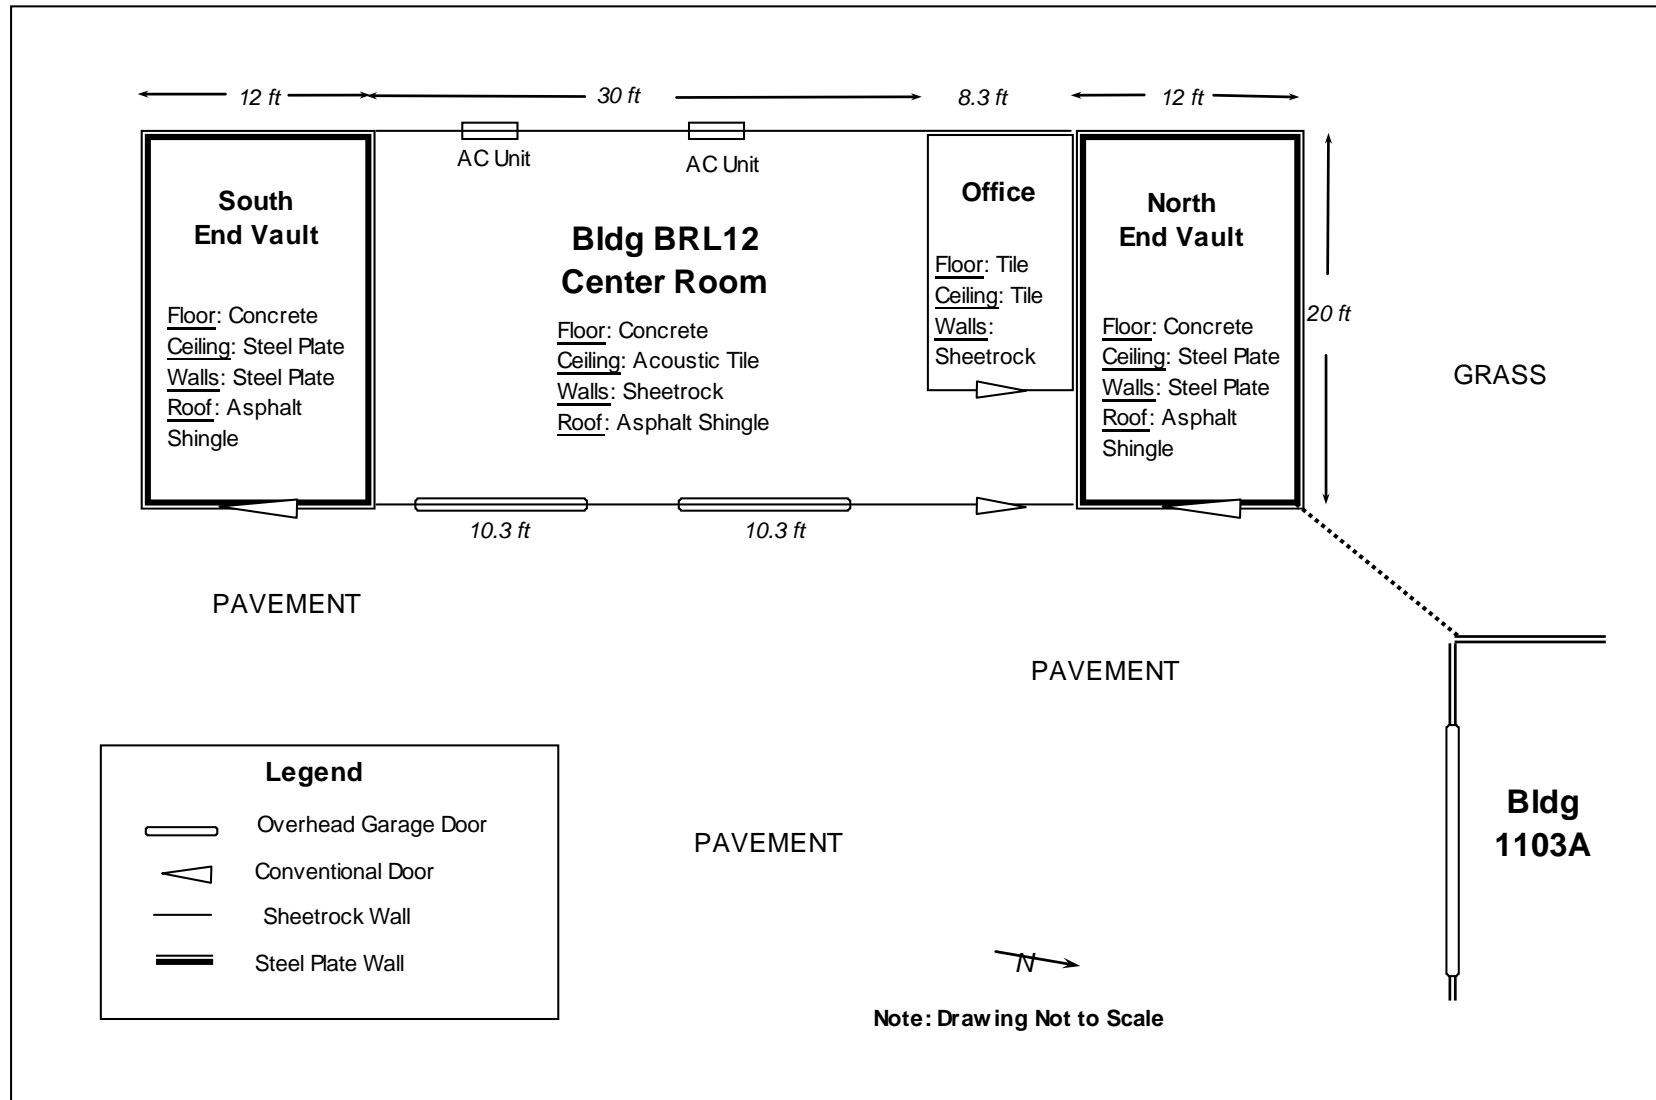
BUILDING BRL12 FLOOR PLAN
